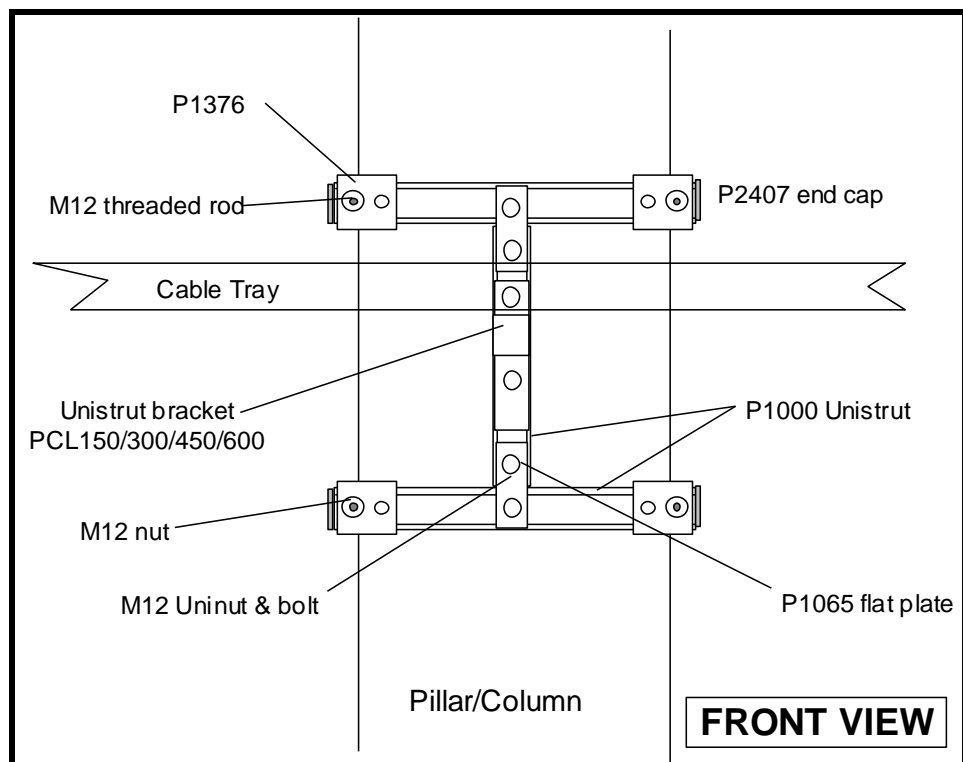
Cantilever Bracket Mounted on Pillar (Front View)
